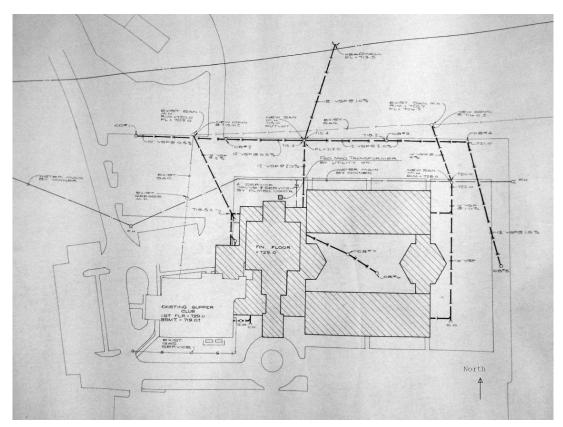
Early motel addition plan, 1973 (Building plans)
